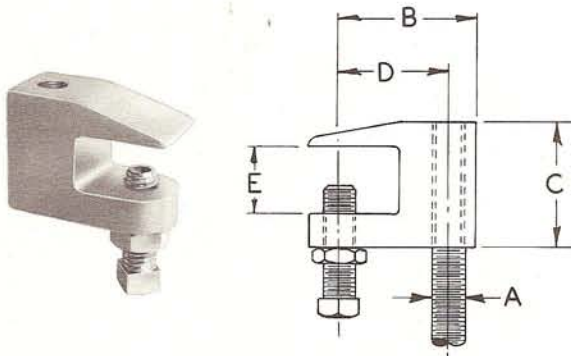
Top Beam Clamps are to be used on the top sections of beams and bar joists, where the roof rests flat on top of the beam.
